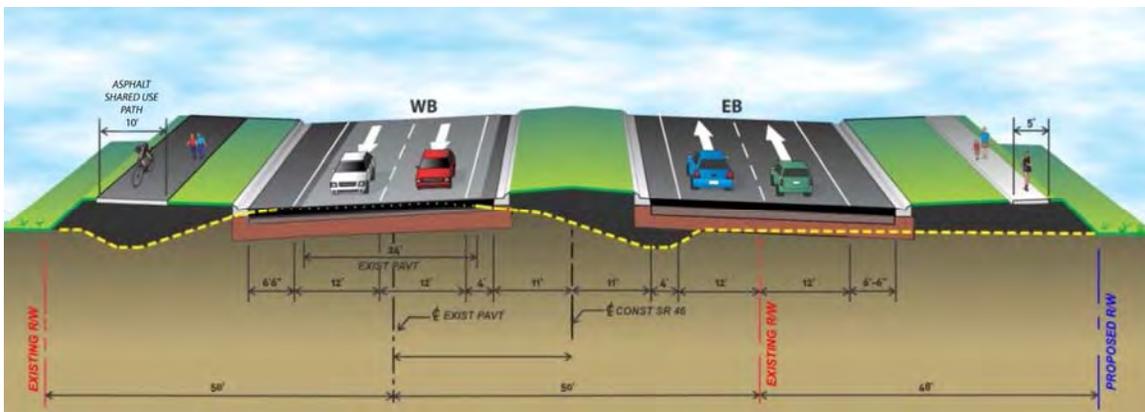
Suburban Typical Section-Widen to the South
